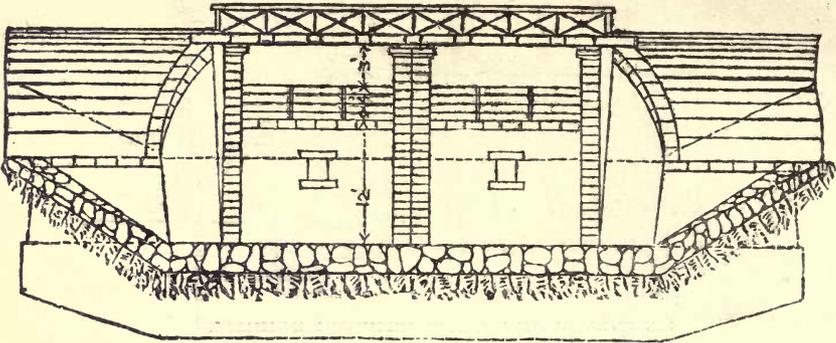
Rear Elevation of Fall on Midnapore Canal.
